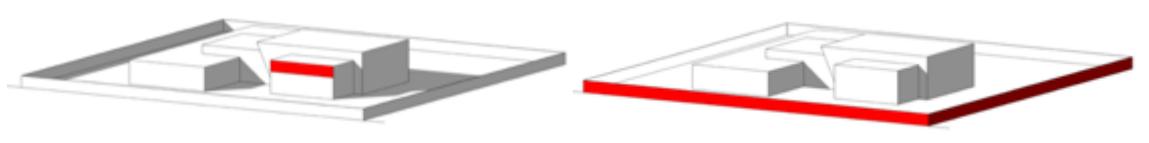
Permitted location of signboards on industrial buildings and surrounding fence/wall
